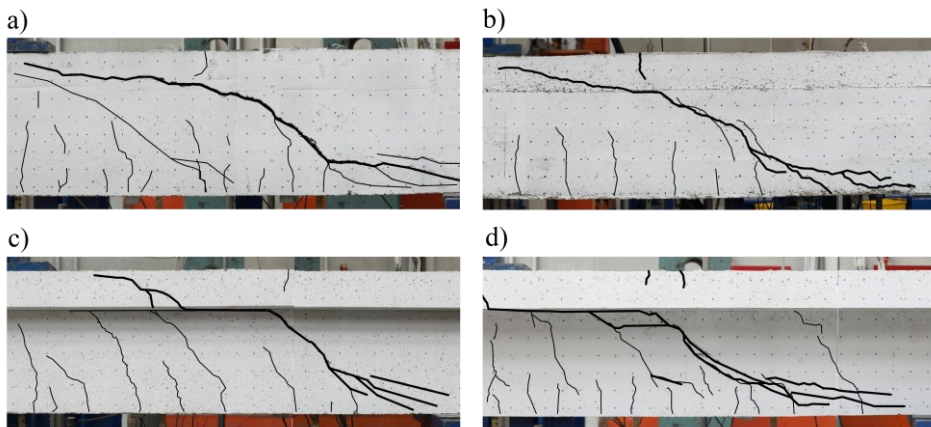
Examples of the test specimens crack patterns: a) rectangular monolithic beam HOP4B1; b) rectangular composite beam NOP1B2; T-shaped monolithic beam NOP3C1; d) T-shaped composite beam HOP4D2.
